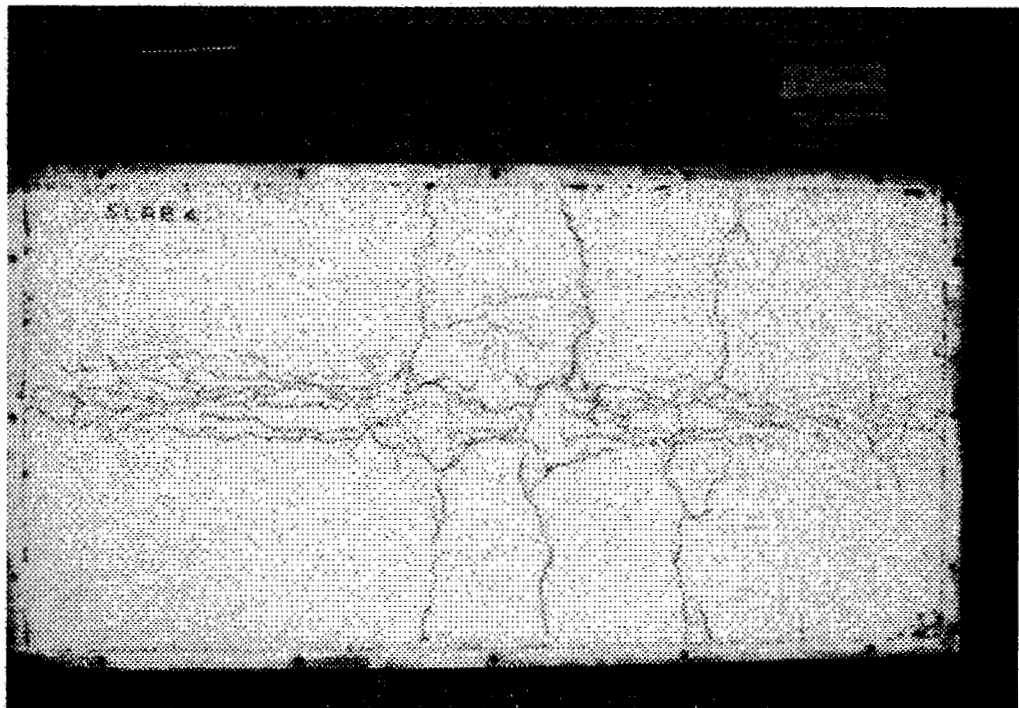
Typical Condition of Slab at End of Fatigue Wheel Tracking Test, Bottom Surface
